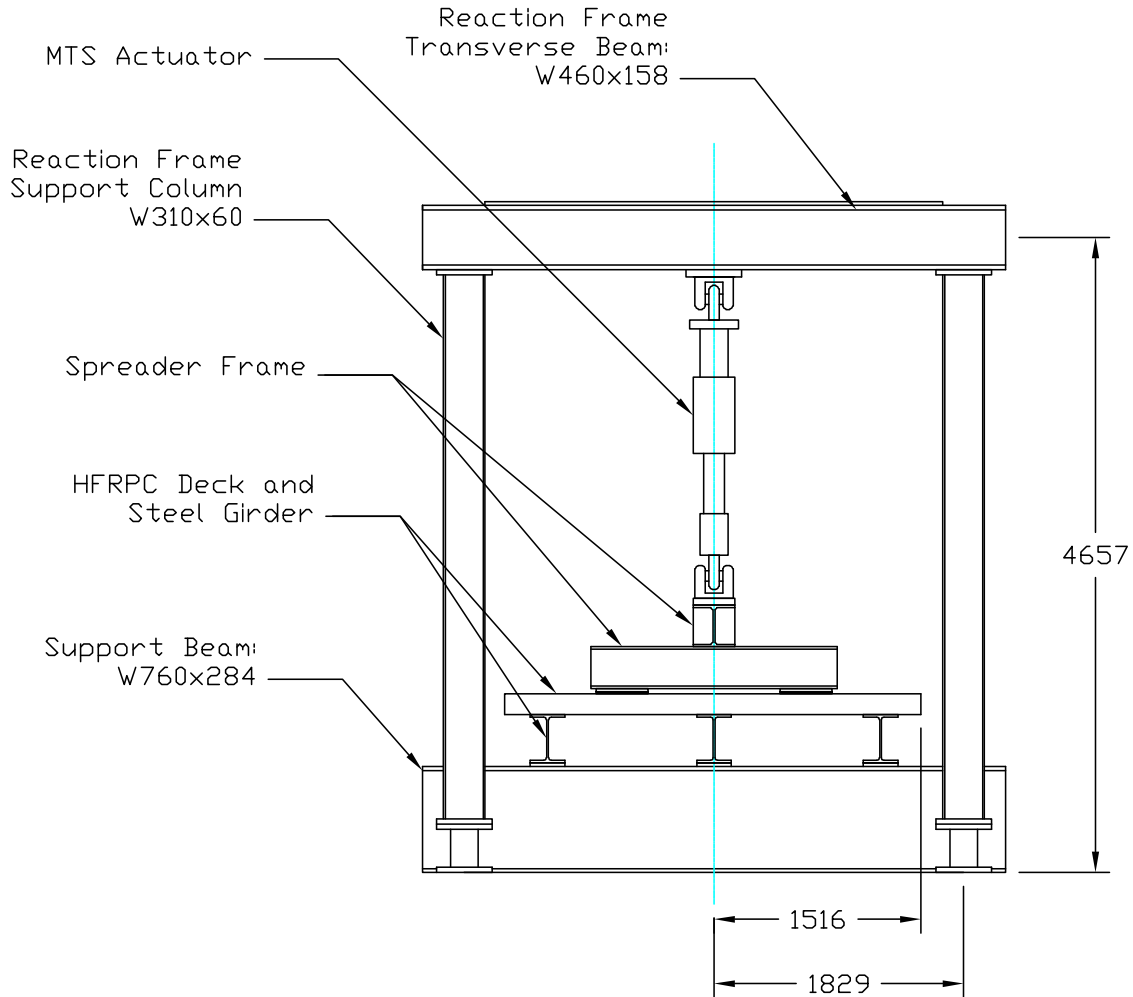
Schematic showing side view of fatigue testing setup (dimensions in mm)
